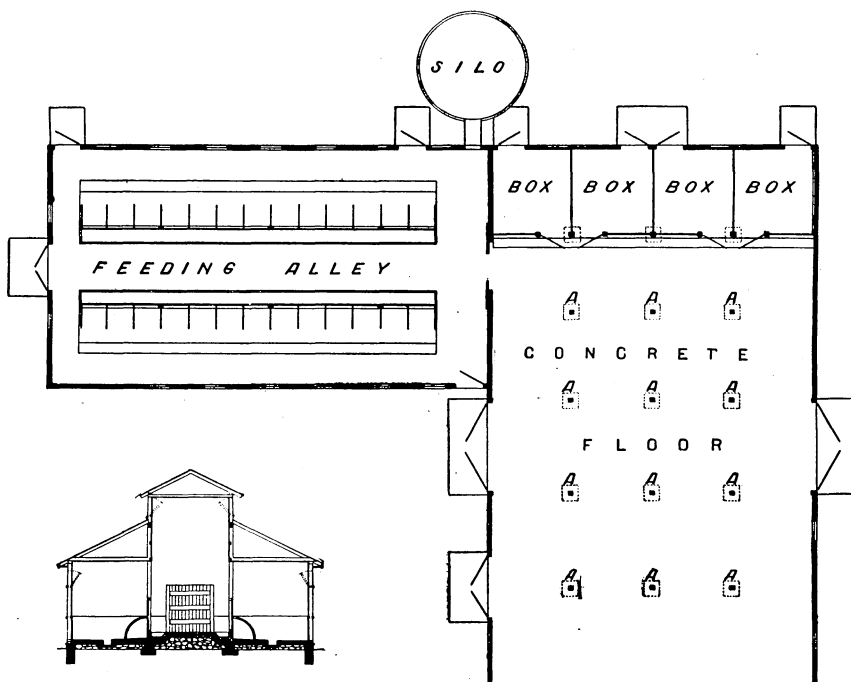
Floor plan and cross section of stable for 26 cows, showing box stalls, silo, and space for wagons and farm machinery.
